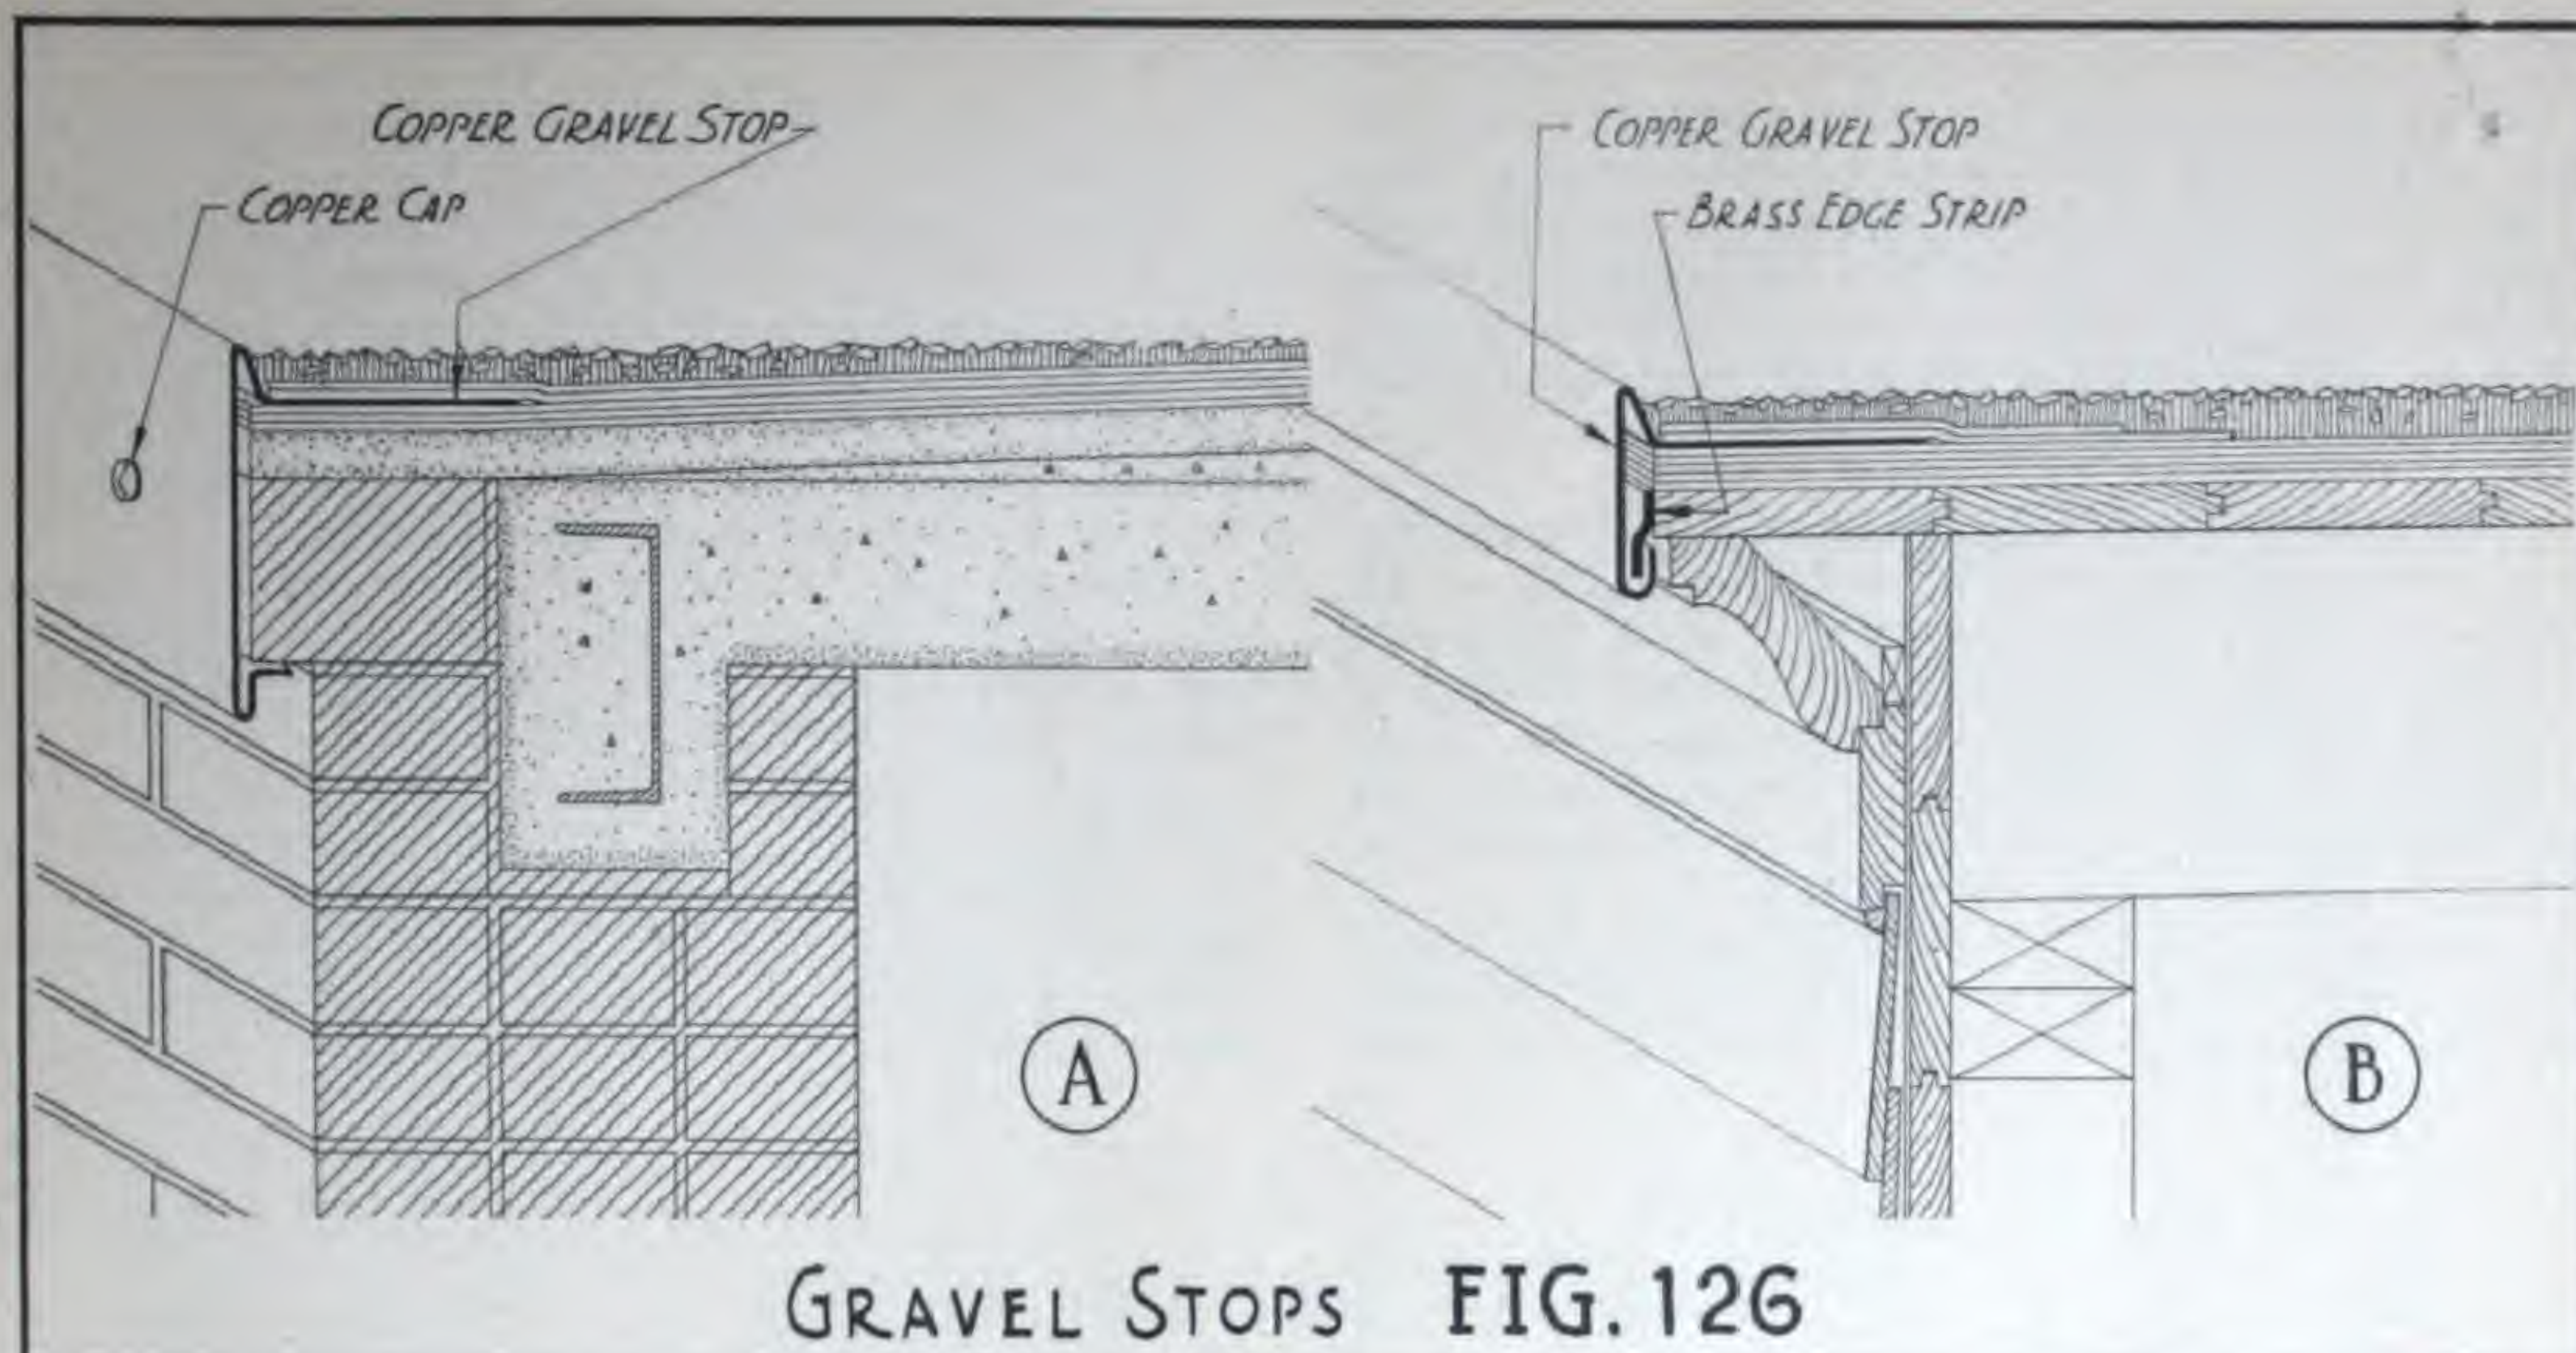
Detail A shows a gravel-stop flashing at the edge of a roof laid on concrete slabs. It is secured with brass screws and lead washers or brass and lead expansion bolts. Holes are drilled into the bricks or slabs about 12" apart and $\frac{3}{8}$ " in diameter. If expansion bolts are not used, small cylinders of sheet lead slightly shorter than the depth of the holes are inserted. Brass wood screws with slotted washers then are used to fasten the copper as detailed in Fig. 103. To prevent water entering the screw holes, copper caps can be soldered over the heads as outlined in Fig. 118.
